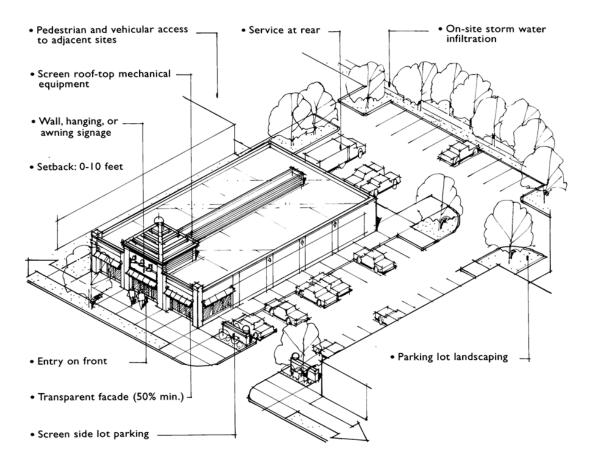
DESIRED NEW COMMERCIAL PROJECT LAYOUT
